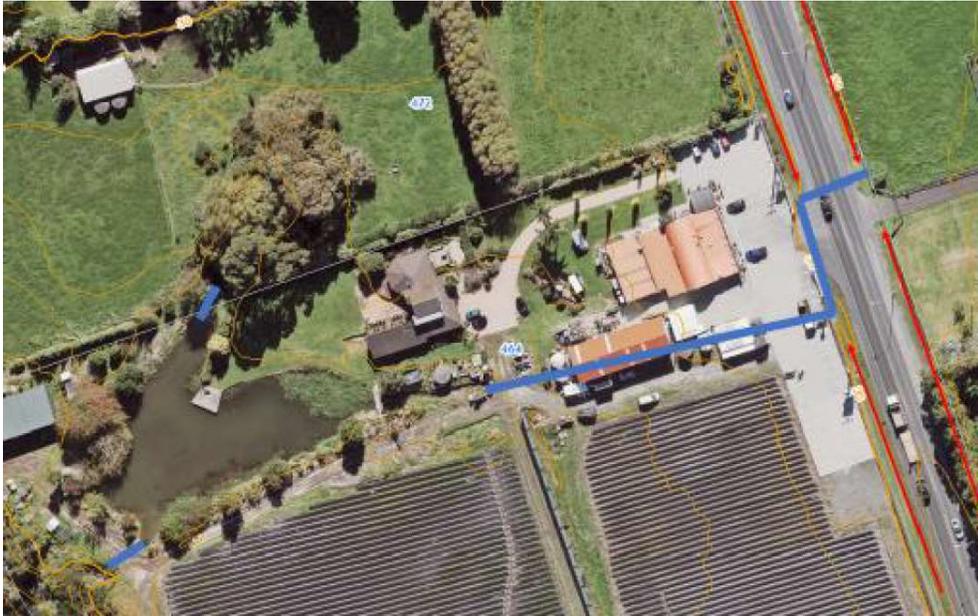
Schematic Image showing the existing stormwater on SH16 and at 464 SH16
